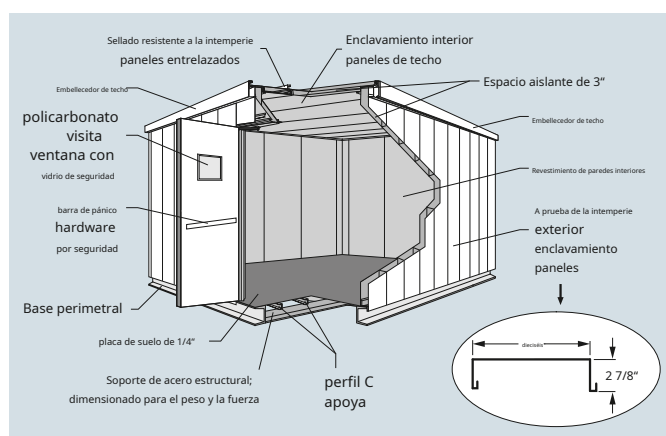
The most widely used design of SIEHOUSE consists in self-framing, interlocking wall and roof panels that are installed on a structural steel support
